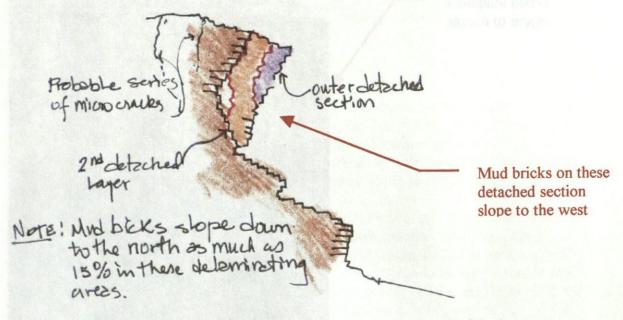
Sketch of detachment of the east wall near the south end of the low center section looking south.
